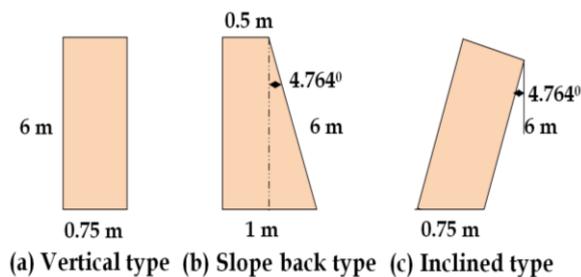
Selected geometric shapes of mass concrete gravity retaining walls
